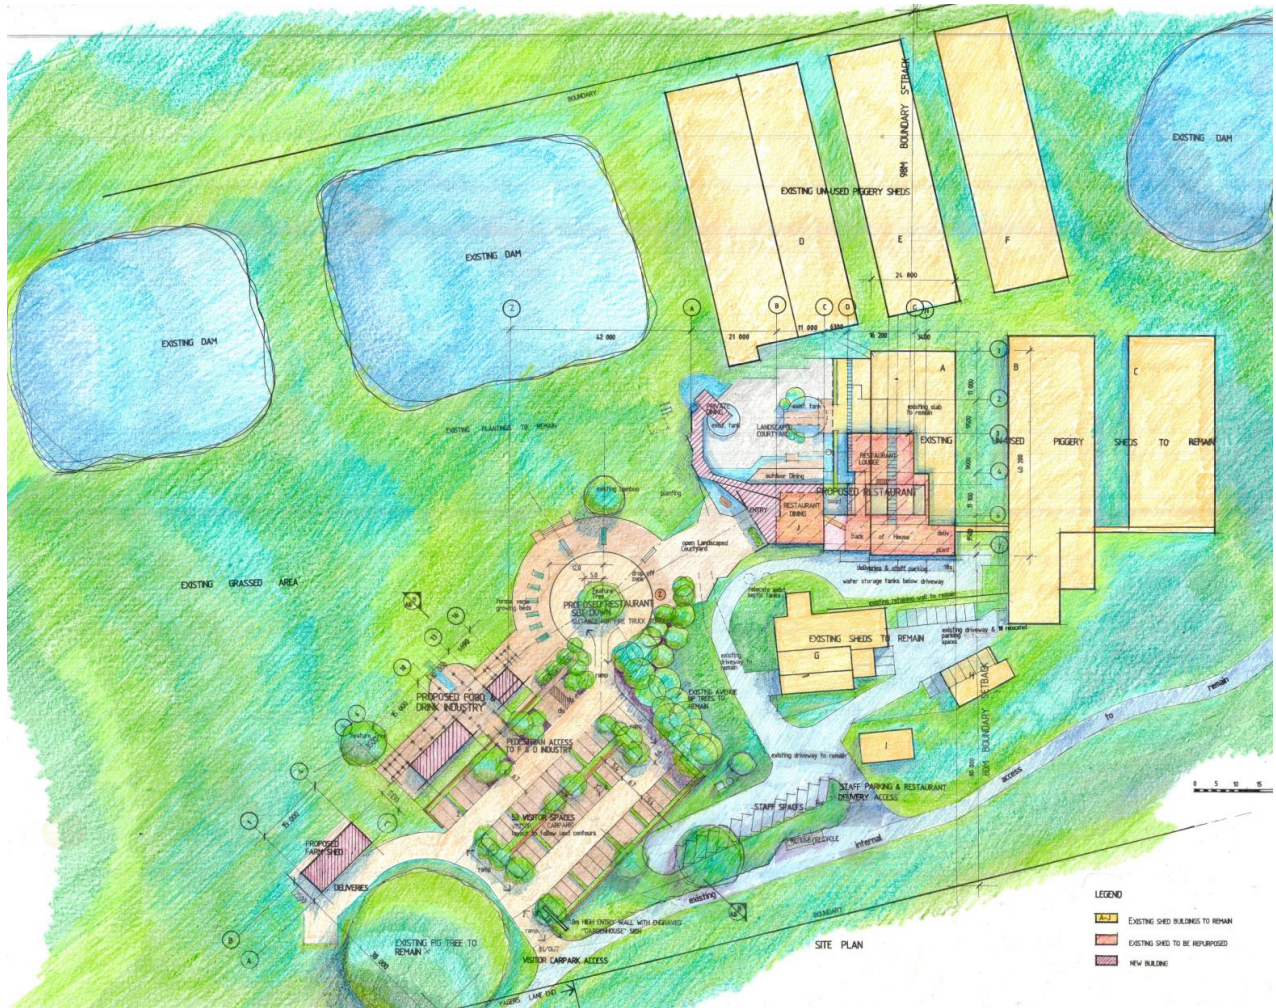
Part Site Plan (Existing piggery sheds in yellow to remain in-situ)
